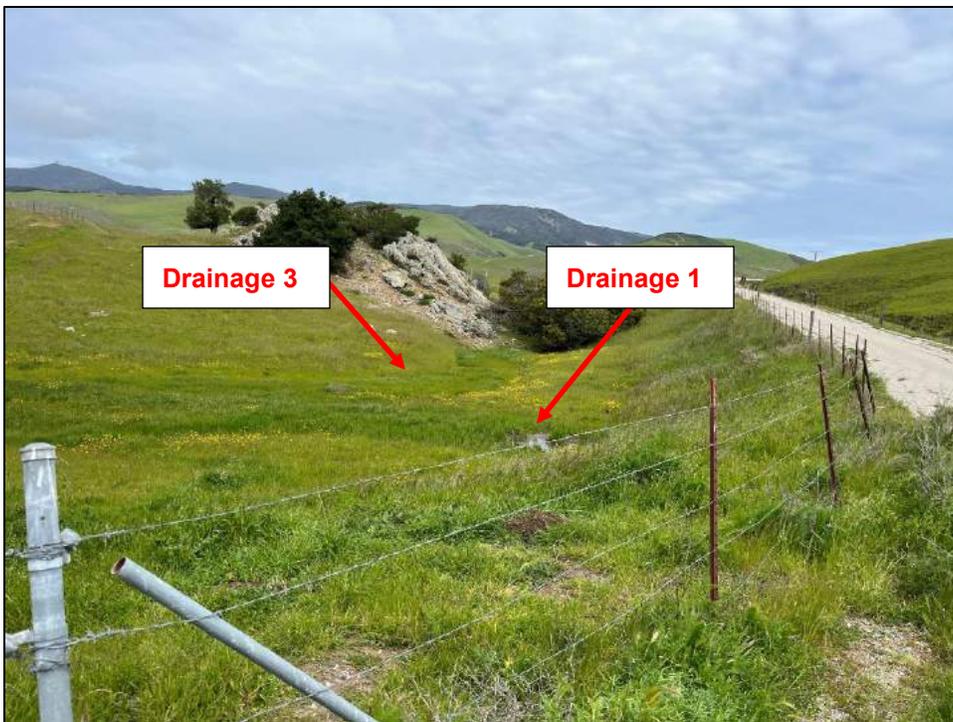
View northeast of outlet of Culvert A, Drainage 1 and Drainage 3. Photo taken April 28, 2023.
